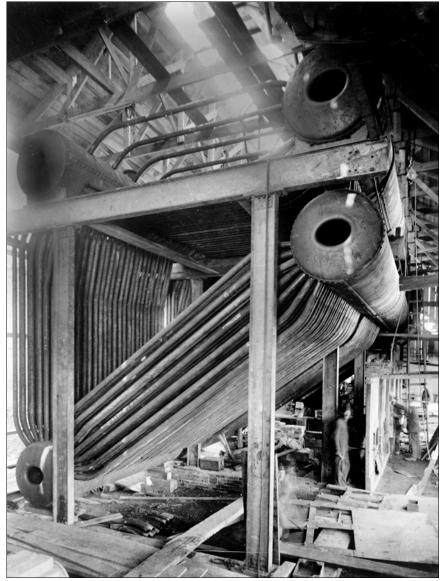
Steel Plant boilers under construction in the Boiler Plant, 1909.
